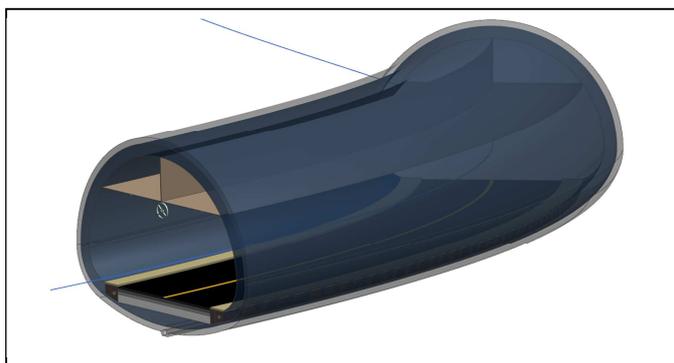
3D model of a road tunnel section as part of a multi-scale product model
